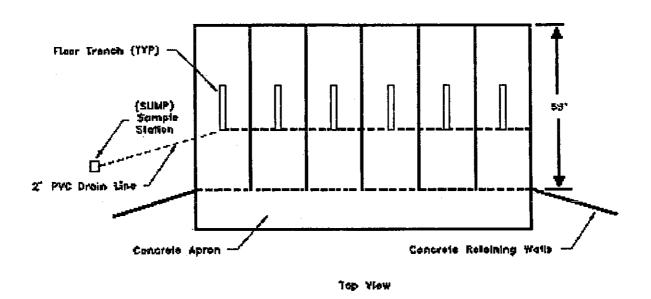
(Proposed) RH-TRU Waste Storage Bunker, Building 7884.
